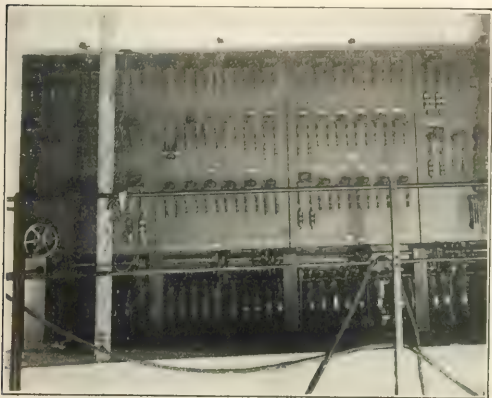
STAGE SWITCHBOARD AT BURNS THEATER, COLORADO SPRINGS, COL.
